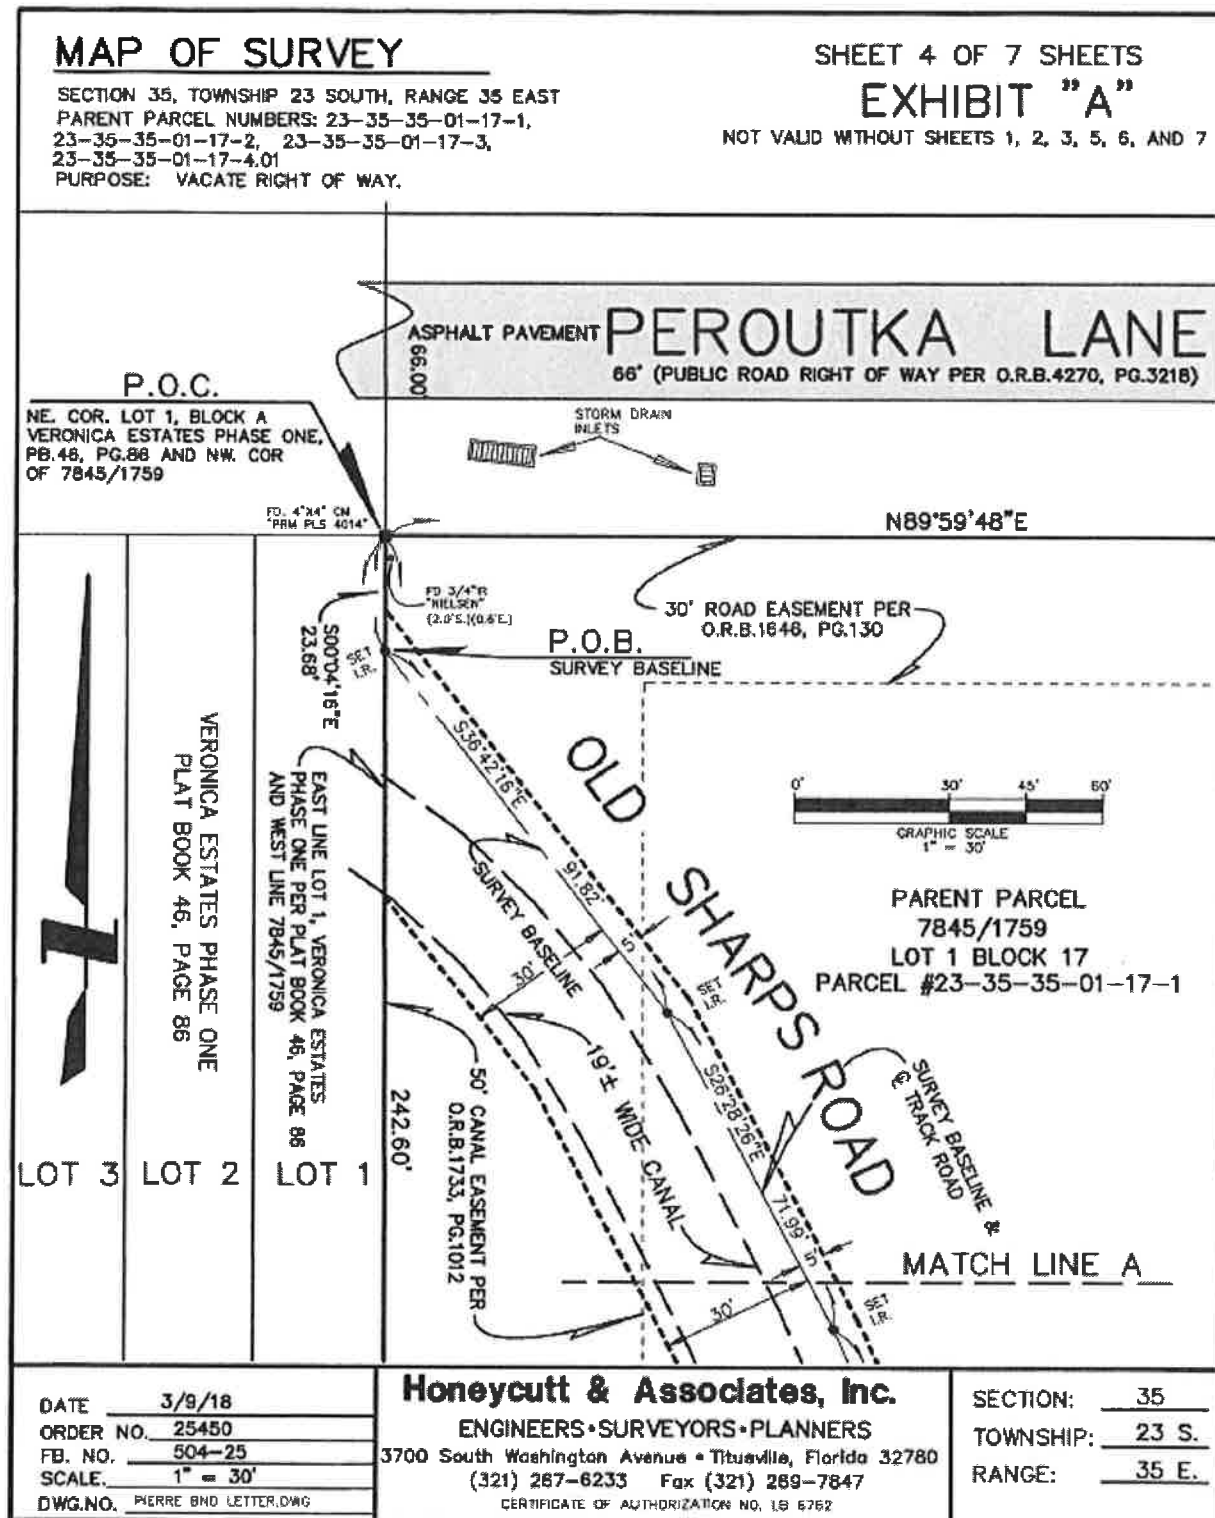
Copy of sketch sheet 4 of 7 of right-of-way Old Sharpes Road.
